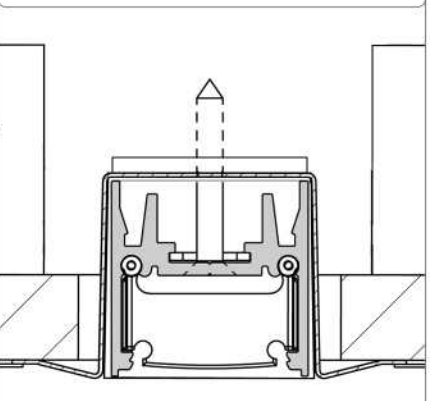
ENSURE EXTRUSION IS MOUNTED SECURELY
